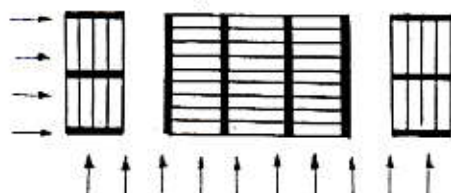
Plan of Load-Bearing Walls of Buildings That Collapsed During Earthquake of 1988 in Armenia
